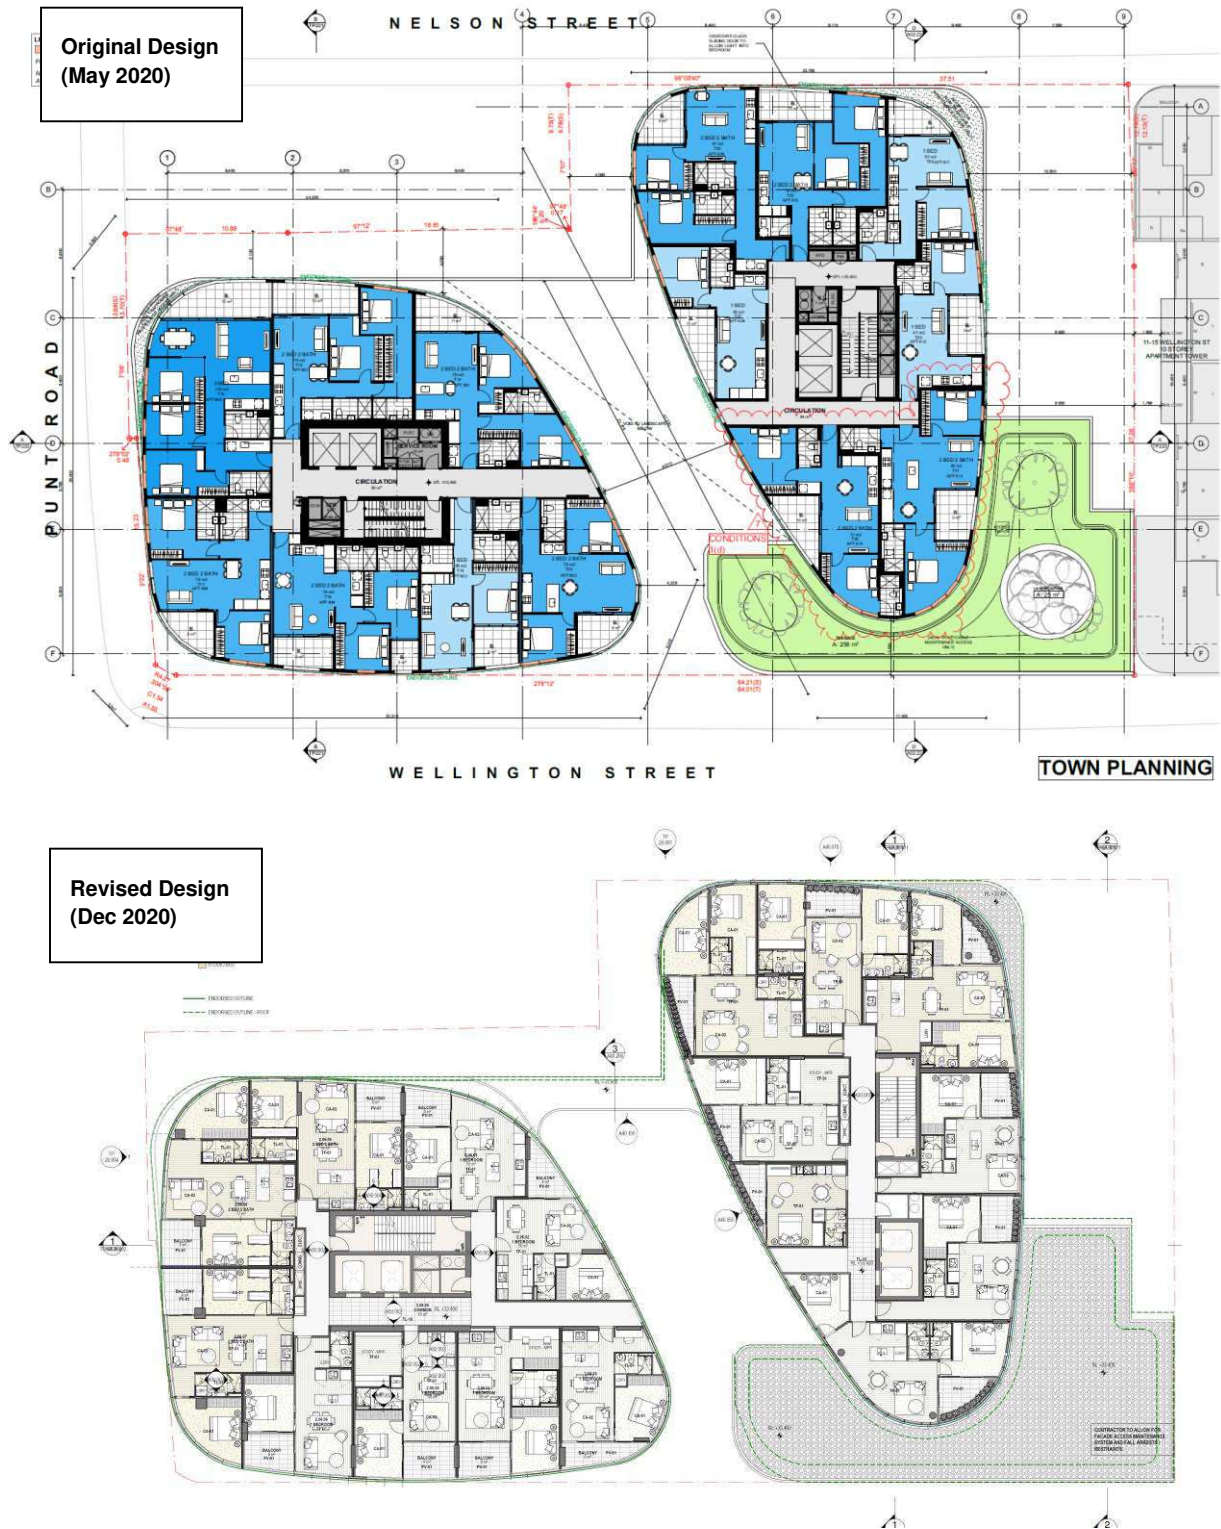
Level 06 plans for the development at One Wellington, St Kilda – comparison between revised design and original design tested in the wind tunnel
